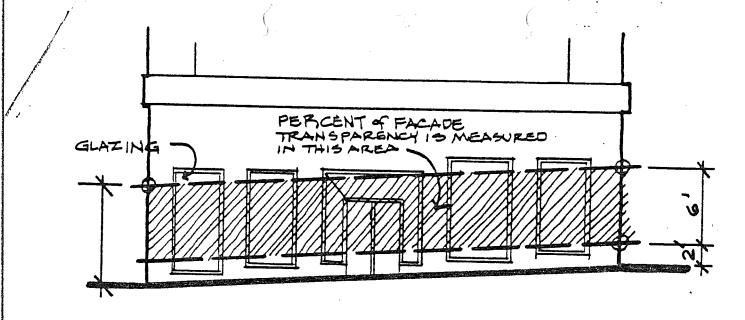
A STREET FACADE TRANSPARENCY
